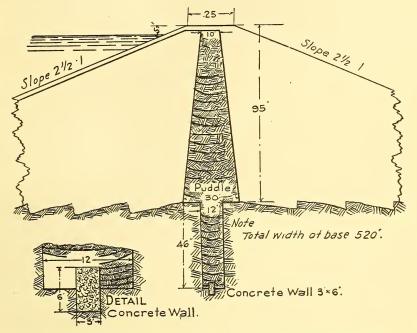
Section of Pillarcitos Dam, showing puddle core and concrete wall in bottom of trench.
